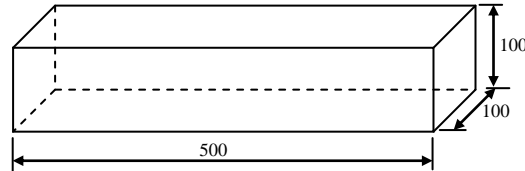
Typical beam specimen (Dimensions in millimetres)
